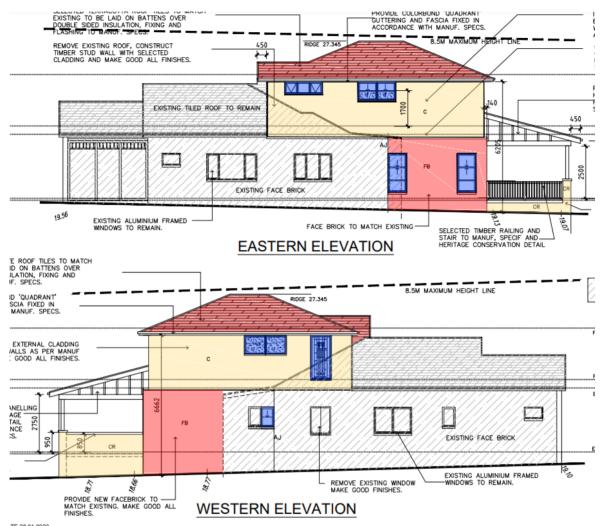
Side elevations of the proposed alterations/additions with second-storey substantially setback behind the front elevation (source: Fedele Design P/L)
